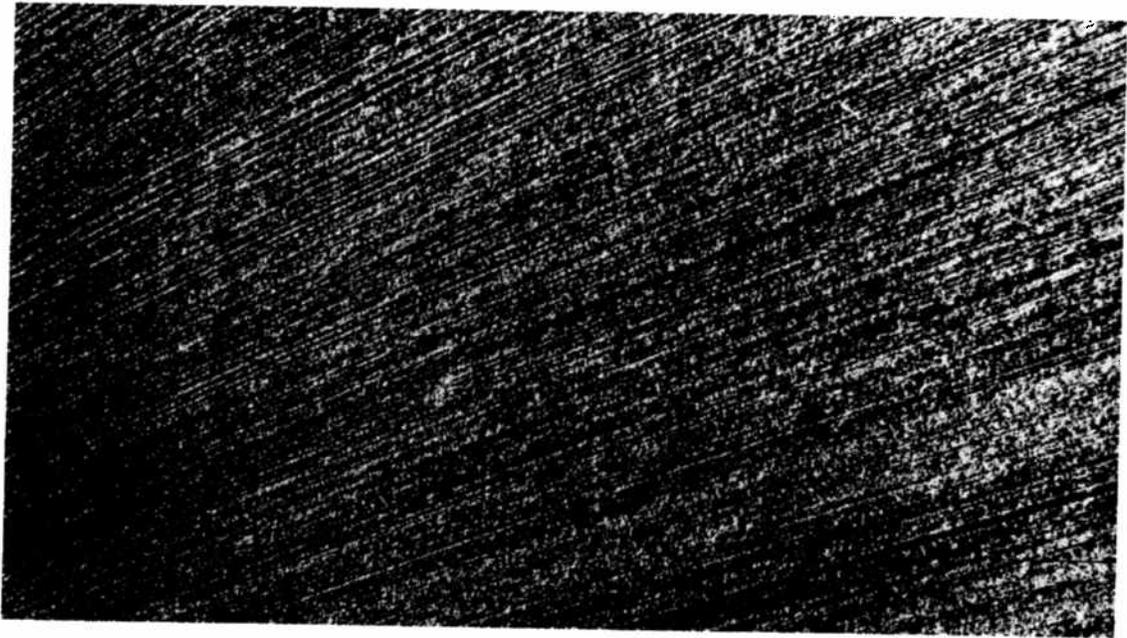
HEAVY PAVING BROOM FINISH
